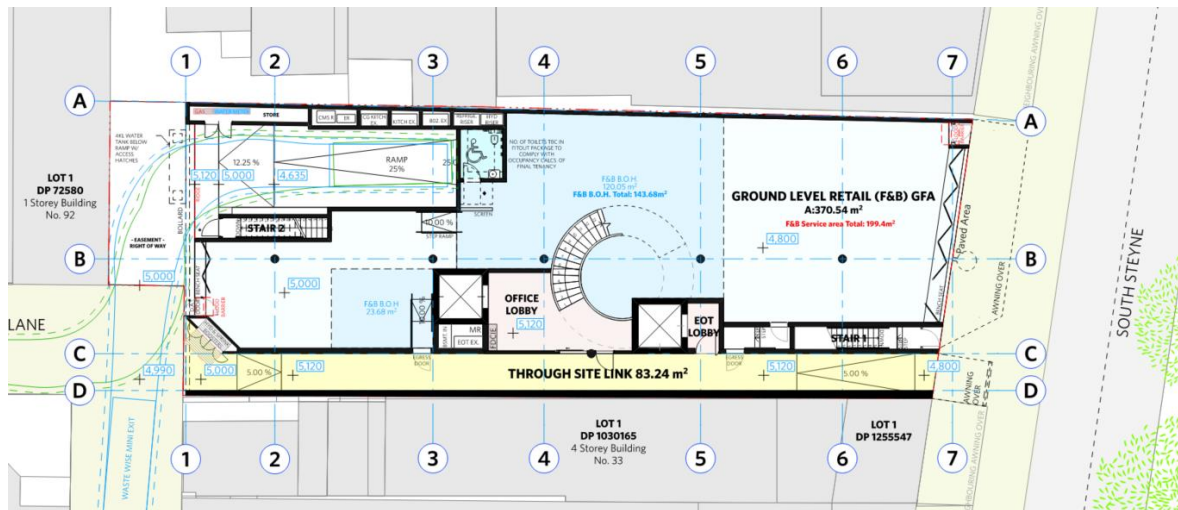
Proposed Site Plan (source: DURBACH BLOCK JAGGERS GA Plan Ground Plan A-DA-110-003 REV DA)
